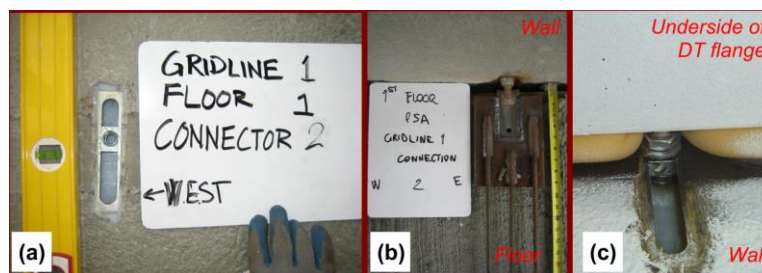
Wall-to-floor connection a) vertical slot in wall, b) insert tab welded to floor embed plate, and c) underside view of slotted connection (Schoettler et al. 2009)
